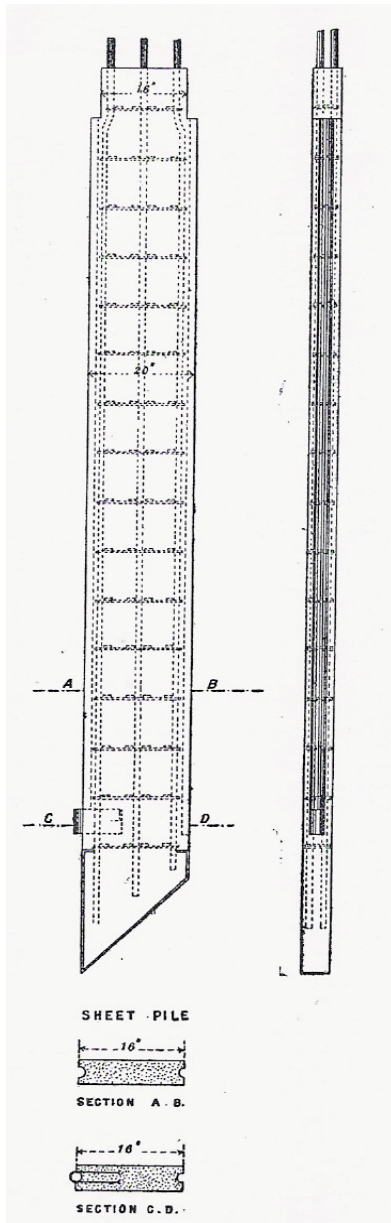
Hennebique concrete sheet pile system [Duplat Taylor 1949]
